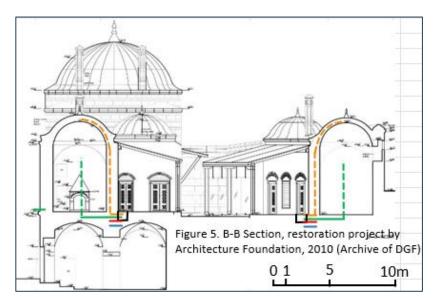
B-B Section, restoration project by Architecture Foundation, 2010 (Archive of DGF)
